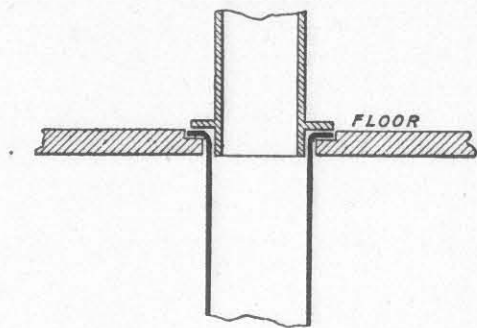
Connection of Earthenware Trap to Lead Soil-pipe by Socketed and Flanged Joint.
